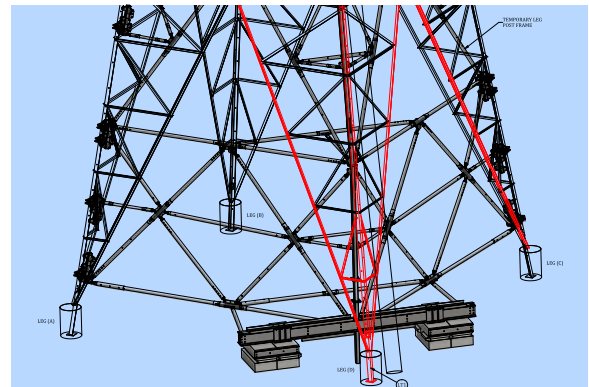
M36-T2 plan for temporary bracing and support brackets to enable repair
